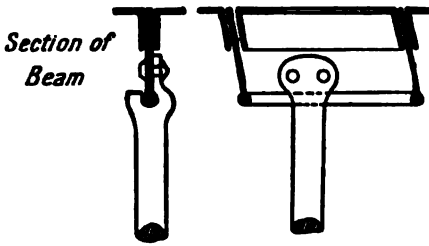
Connection of Pillar Head to Bulb Plate Beam.
